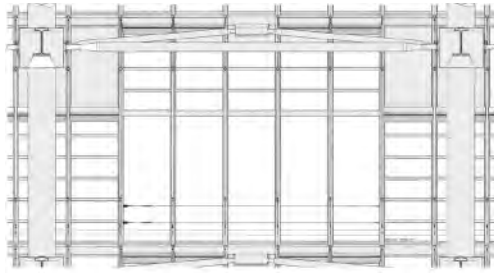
Piano+Rogers Architects and Ove Arup & Partners, Centre Beaubourg, Final Design, Facade detail (with opaque members in grey), 1977 (Renzo Piano Foundation, Genoa).
